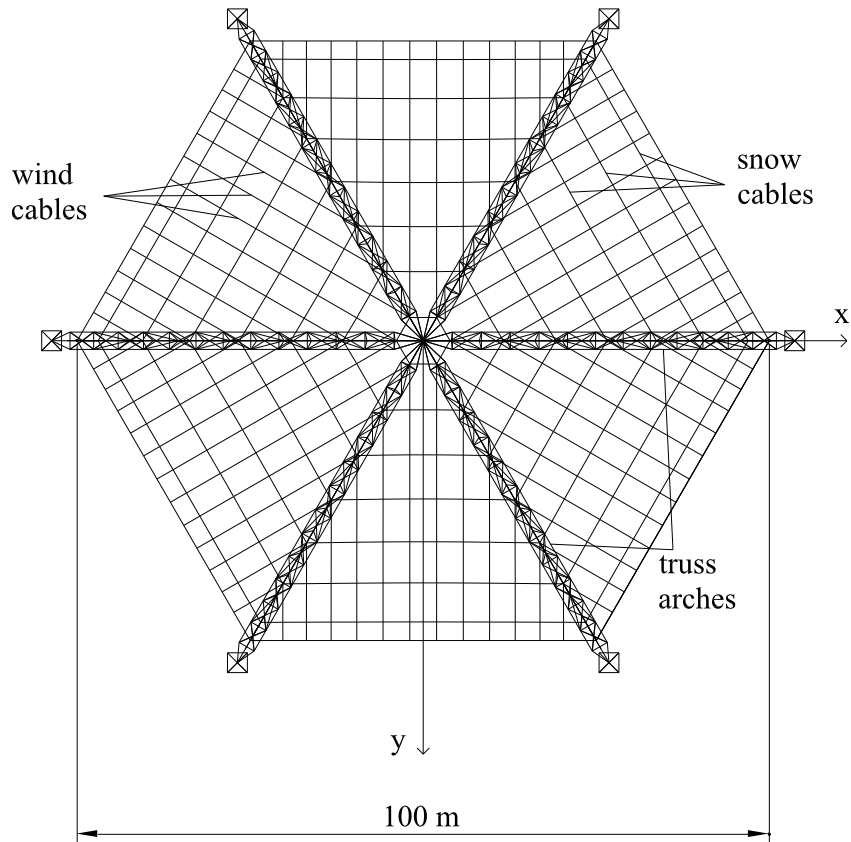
Floor plan of model 3, cable net supported by three truss arches
